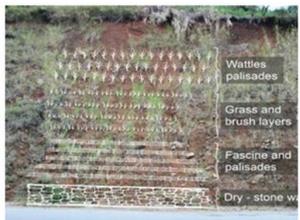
Proposed bio-engineering measures at the demonstration site km 19+800
